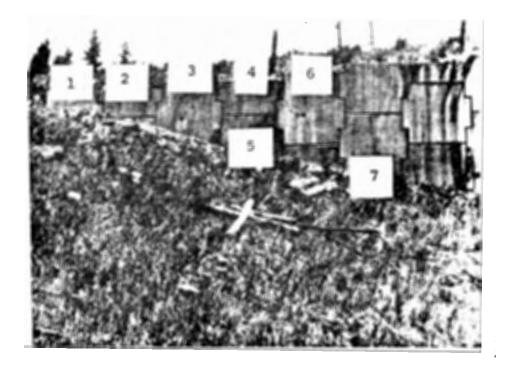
Structure 4: Panels chosen for study on west end of wall.
